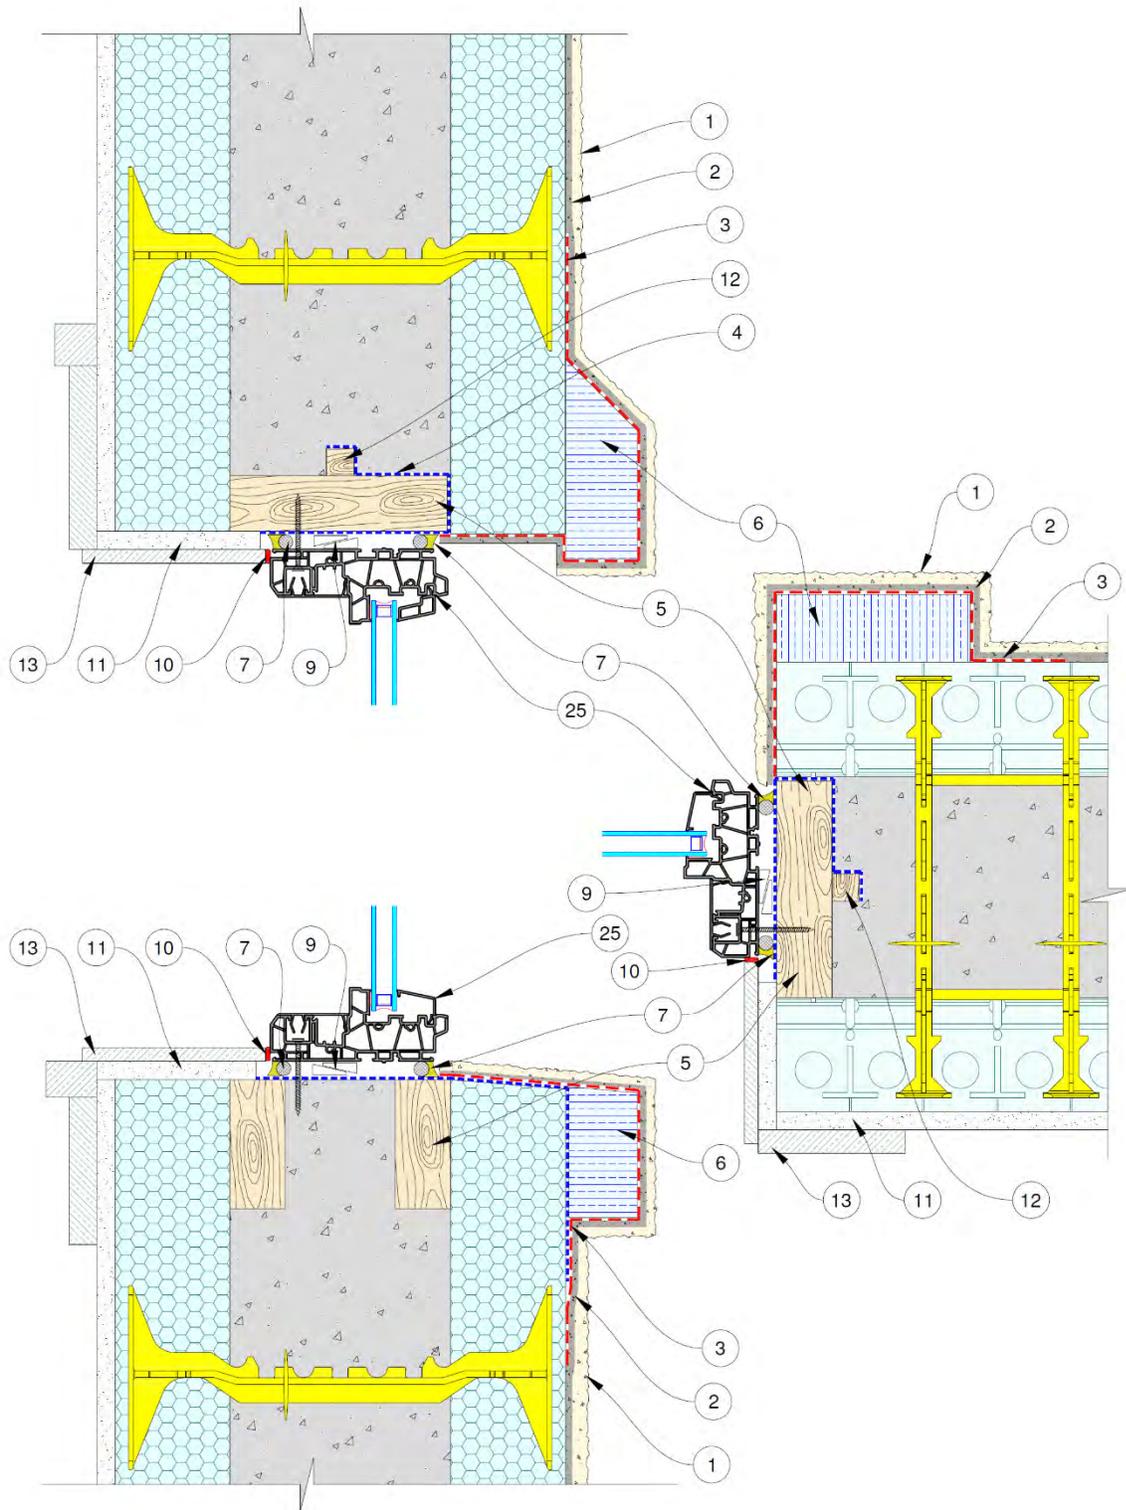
ICF Window Assembly - Wood buck-out, Boxed window centered, EIFS/Stucco lamina
